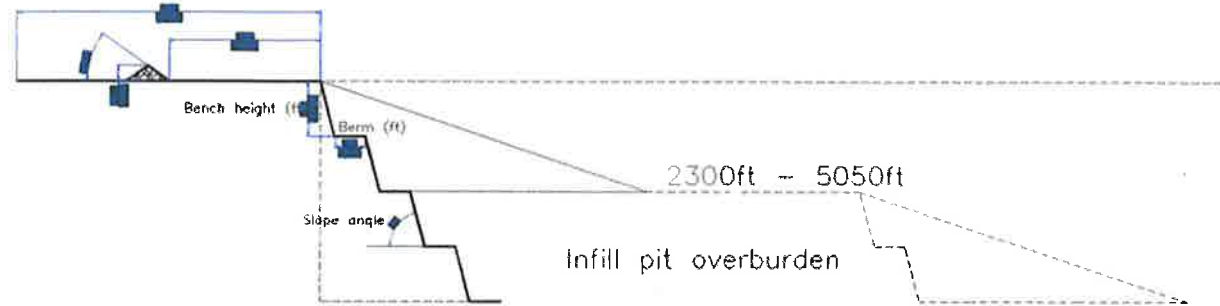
Cross-section of benched highwall and final reclamation slope 3H:1V
